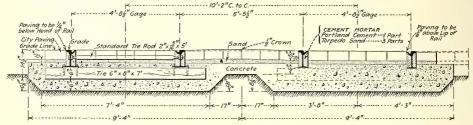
CHICAGO STANDARD TRACK TYPE NO. 2A; CONCRETE FOUNDATION AND WOOD TIES
